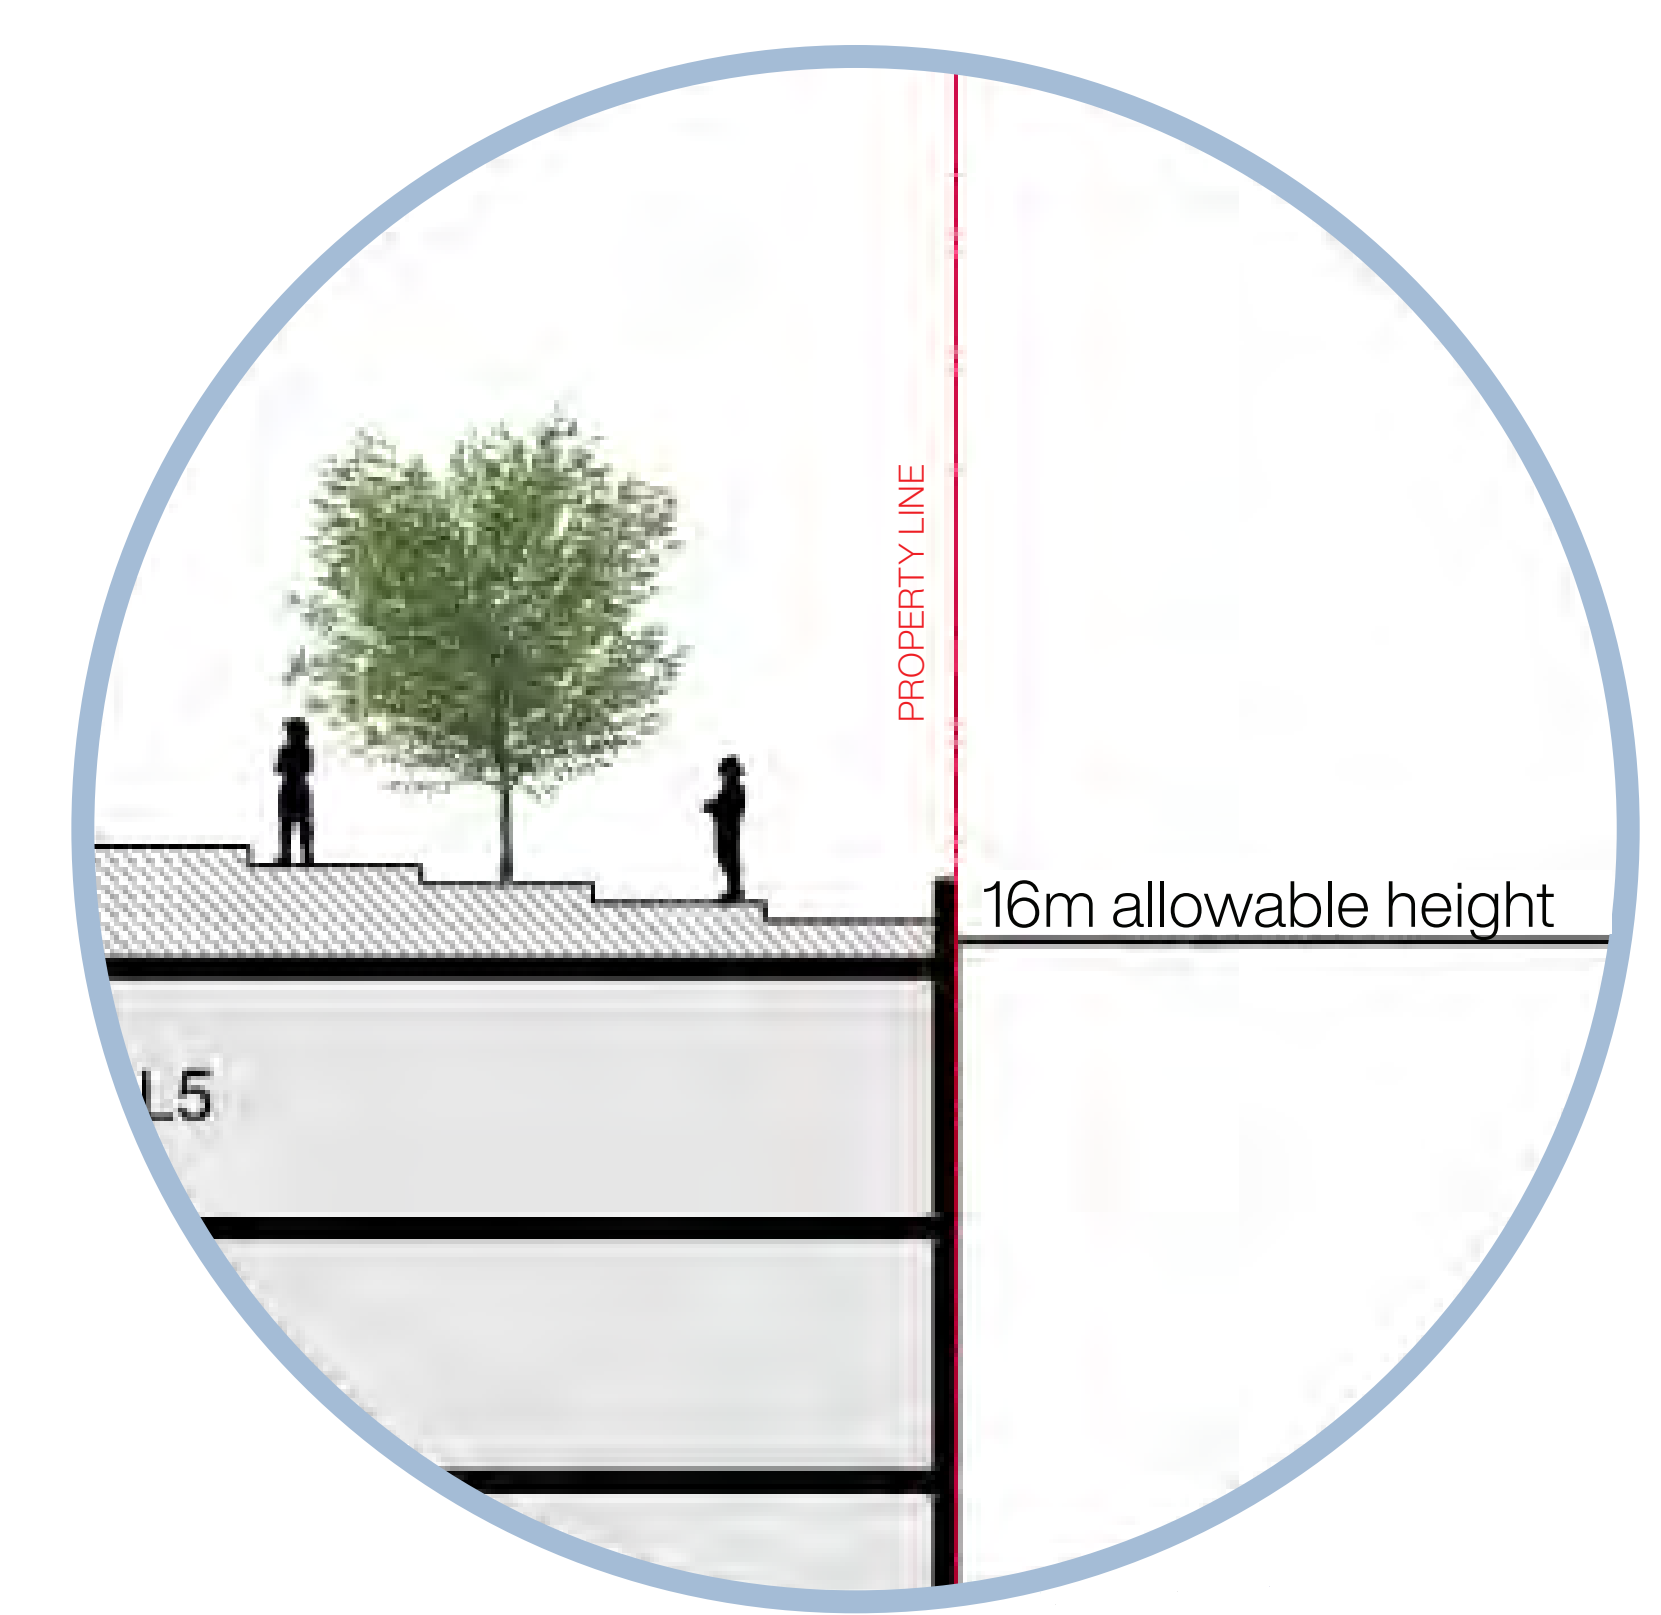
Temporarily exposed wall face along the north edge of The Vintage at Waterscapes, away from activated street area
